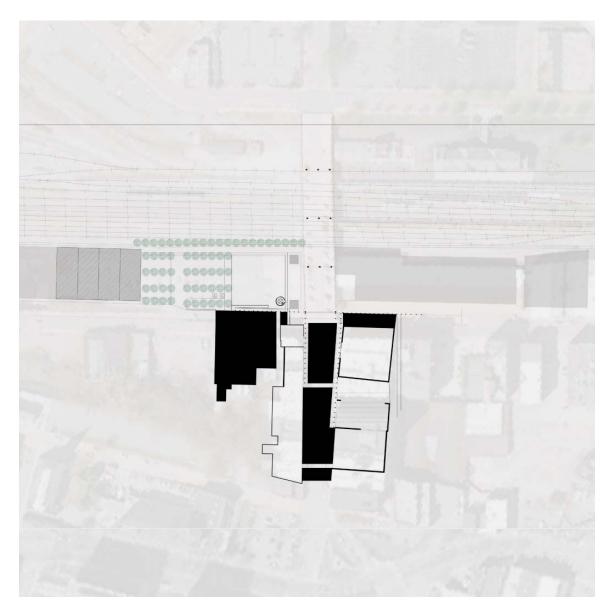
Site; Intersection of 100 Block Gay Street and Jackson Avenue with author's design proposals (showing revisions to Underground Knoxville as well)
